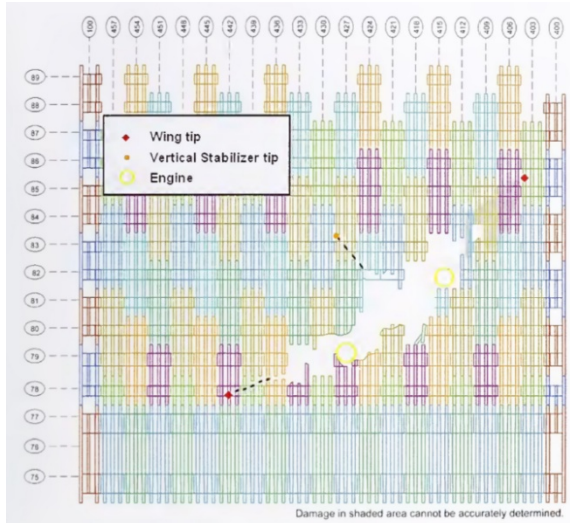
South façade impact zone at the South Tower (NIST, 2005).
